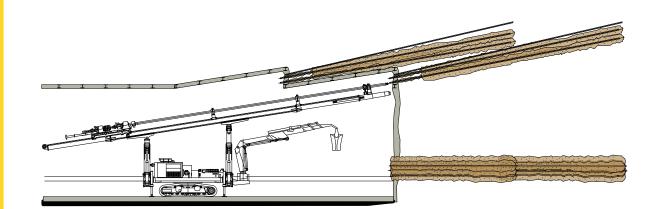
Longitudinal section of the eastbound tunnel, showing the position of the columns for consolidation of the dome and excavation front.
